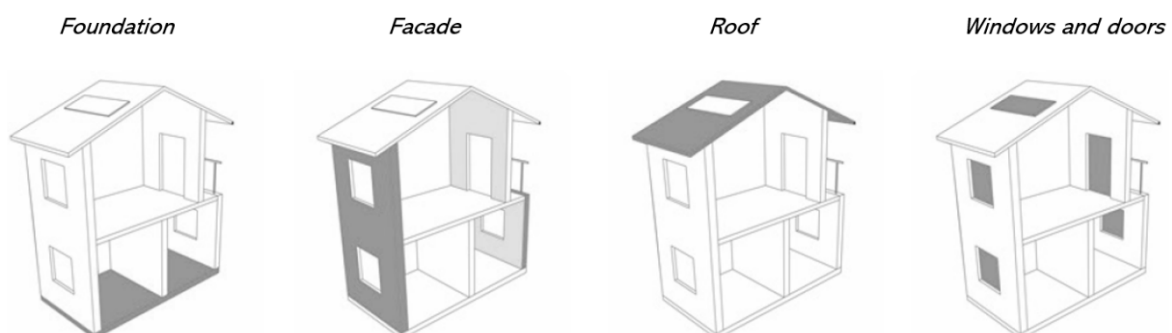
Building envelope components (Adapted from Wahi, 2020).
